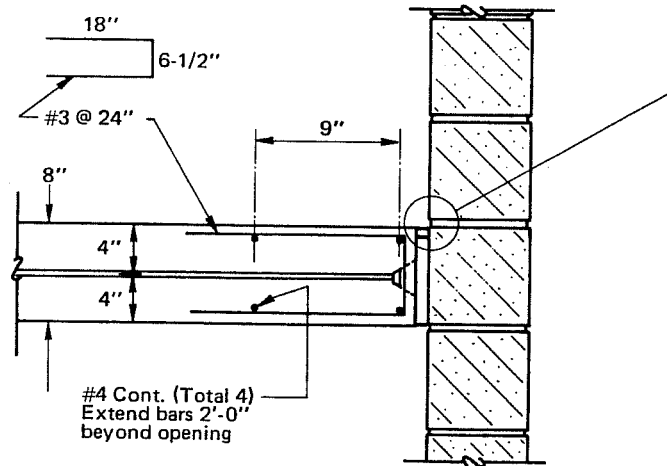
Detail of Post-Tensioned Anchorage Zone in Slab which is Separated from the Wall
